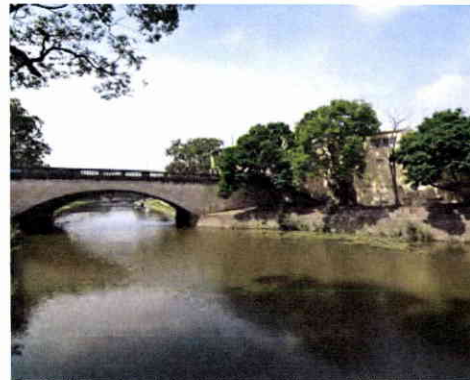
View of south bank of site and Lennox Bridge looking downstream from the north bank. Source: JPW Site Photo
